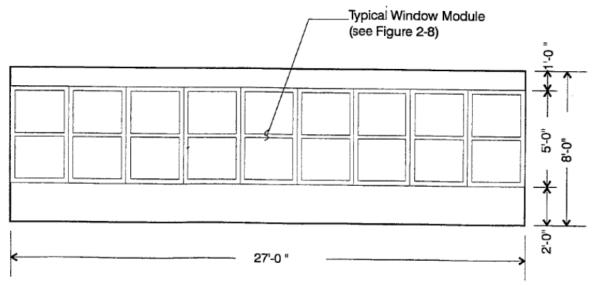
Case L160A East and West Wall Elevation Showing Windows (ANSI/ASHRAE 2011, Figure 7-16)
